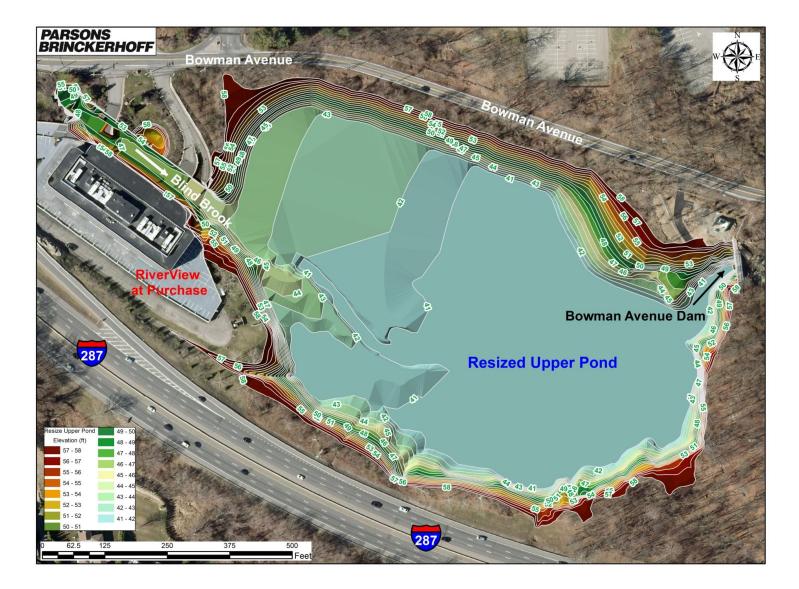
Proposed TIN and 1-foot Interval Contours of Resize Upper Pond
